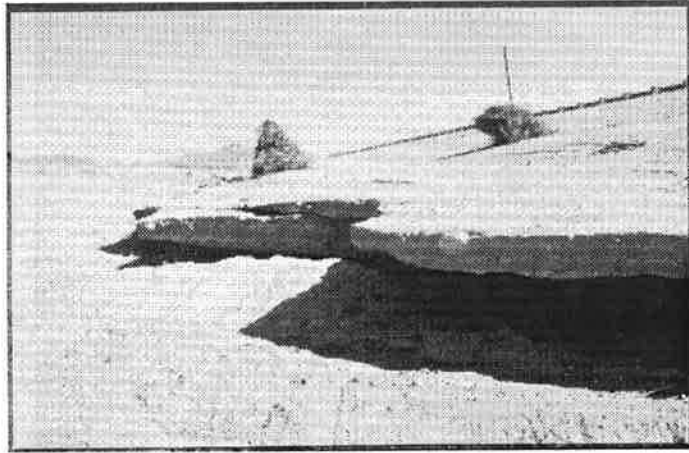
Shows an embankment which sustained damage but did not fail during a flood.
